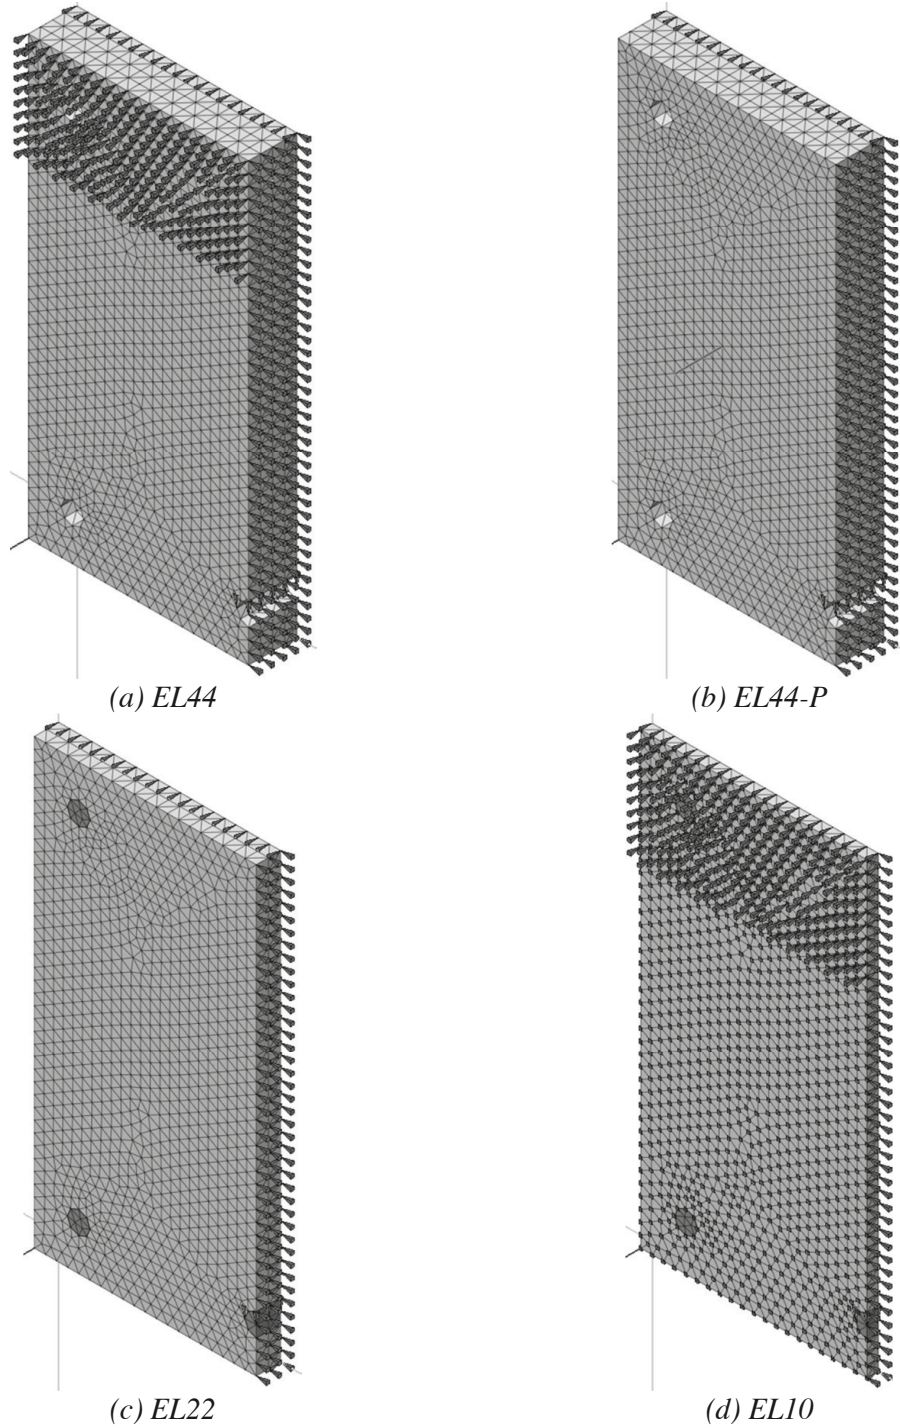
Depictions of section models; (a) EL44: stirrup in centre, (b) EL44-P: stirrup in centre, front nodes restrained to same plane, (c) EL22: half a stirrup in back, (d) EL10: equivalent stirrup in centre. In (a) and (b) the rebar elements are hidden to better see the element size in z -direction
